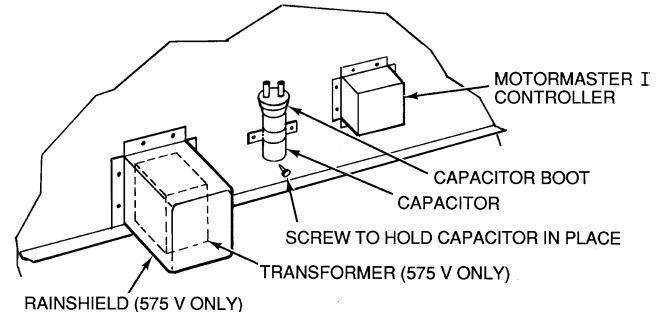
Mounting Motormaster I Controller, Capacitor, and 575-V Transformer; 48/50DJ,DK and 50DW,DY024-030 Units
